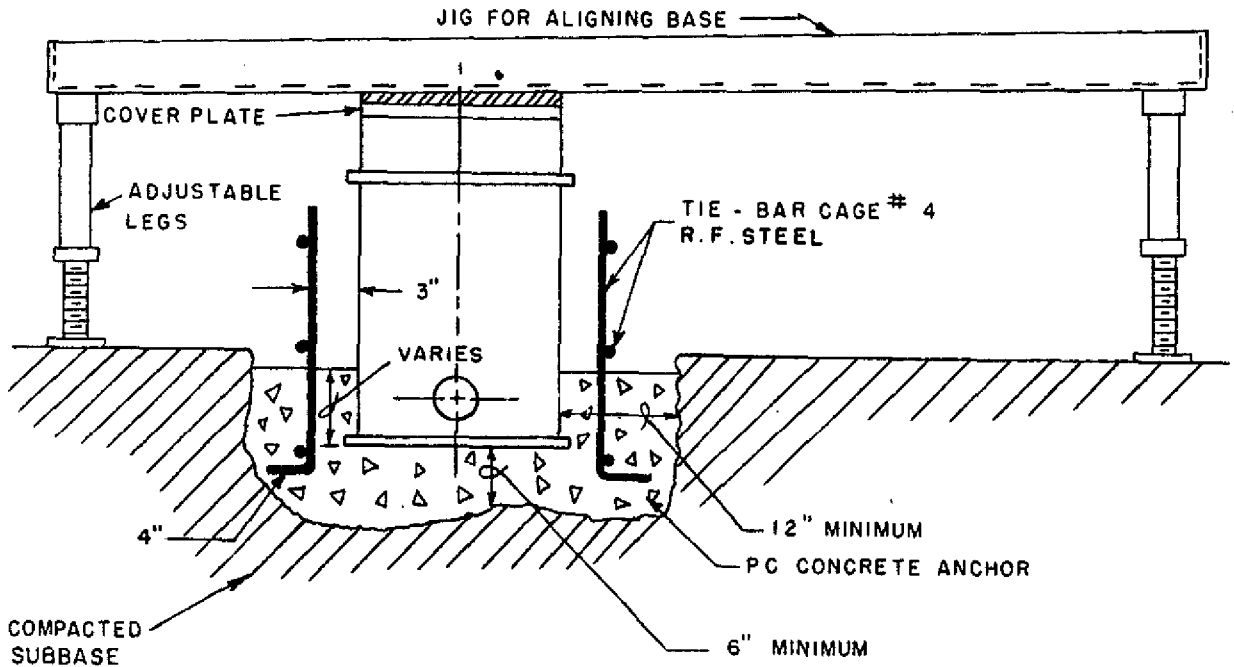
SECTION THROUGH BASE AND ANCHOR, BASE AND CONDUIT SYSTEM, RIGID PAVEMENT
